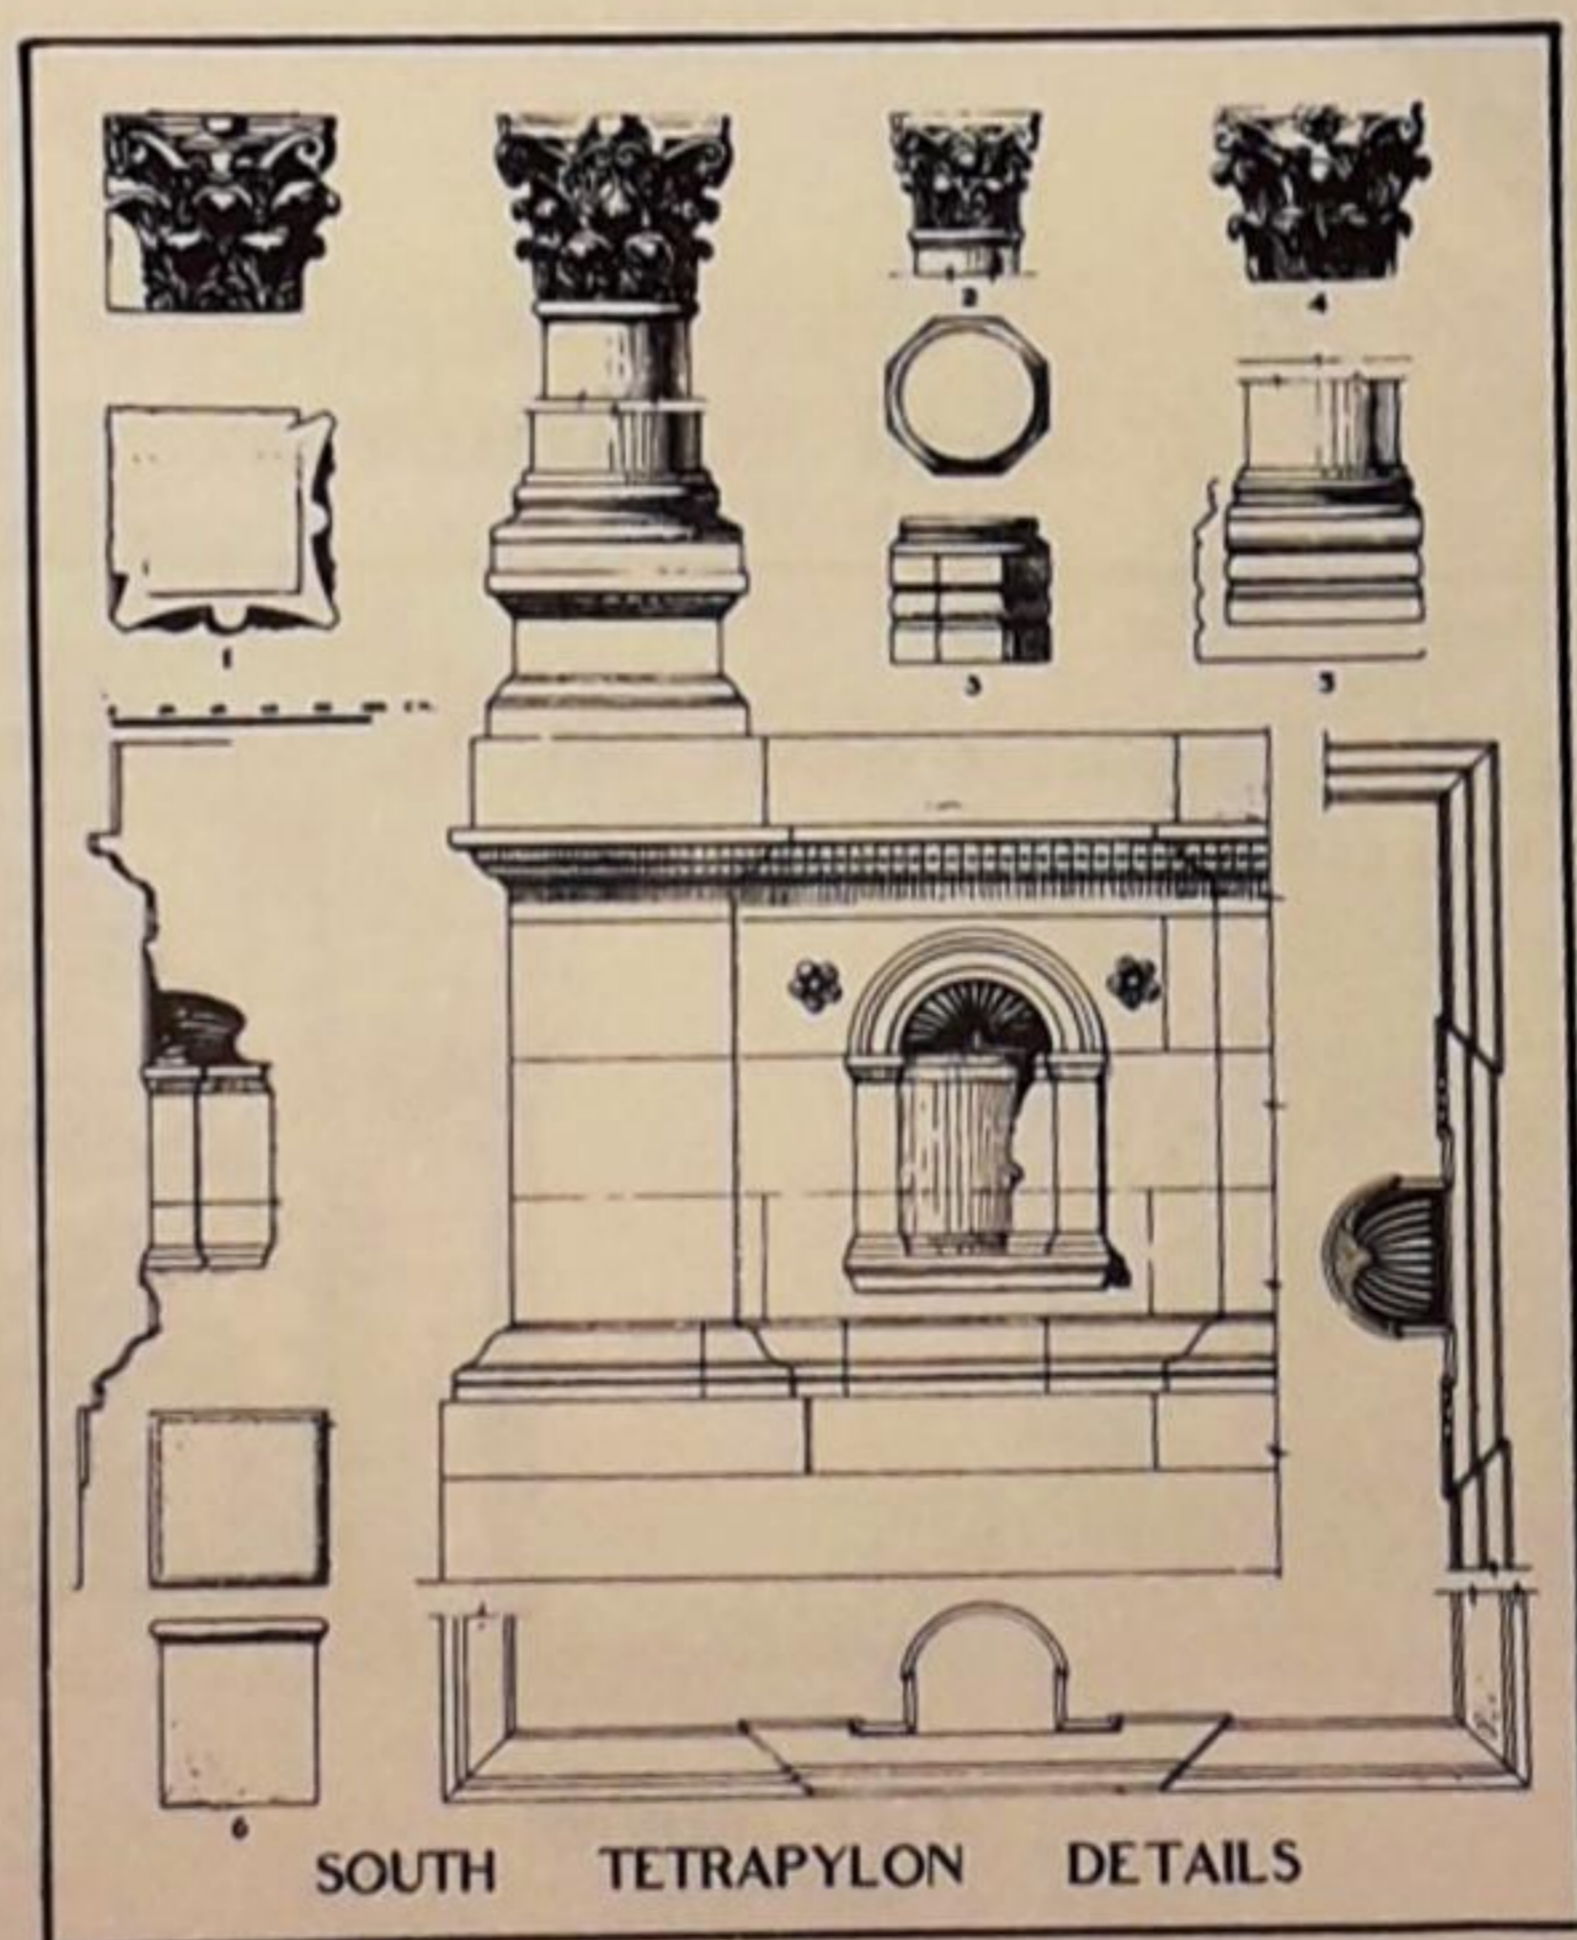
Gerasa, the south tetrapylon (architectural details).
